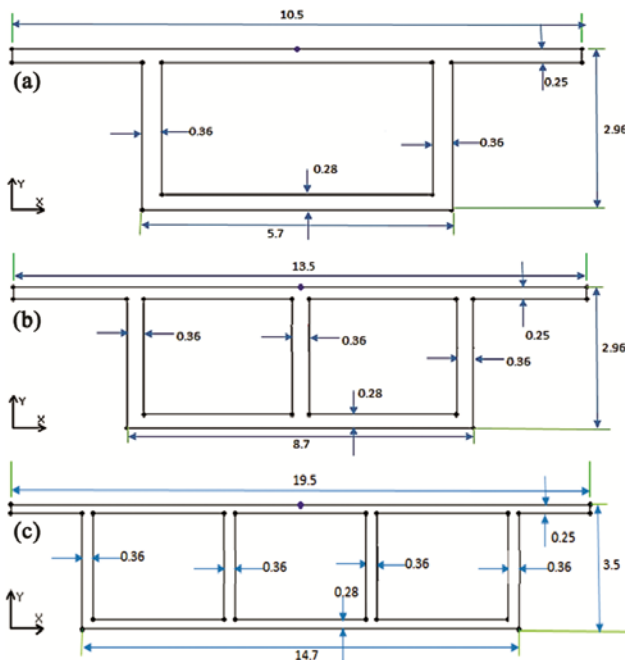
Cross sections of box girder bridge for (a) single cell section, (b) double cell section and (c) triple cell section.
